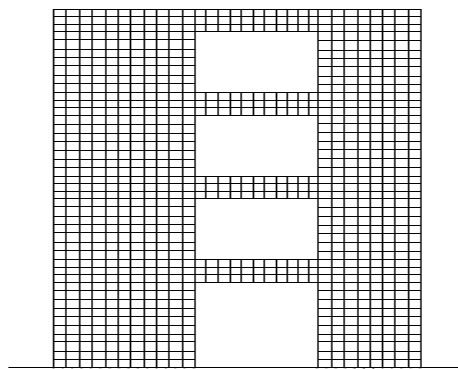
Finite Element Model of a Coupled Shear Wall
